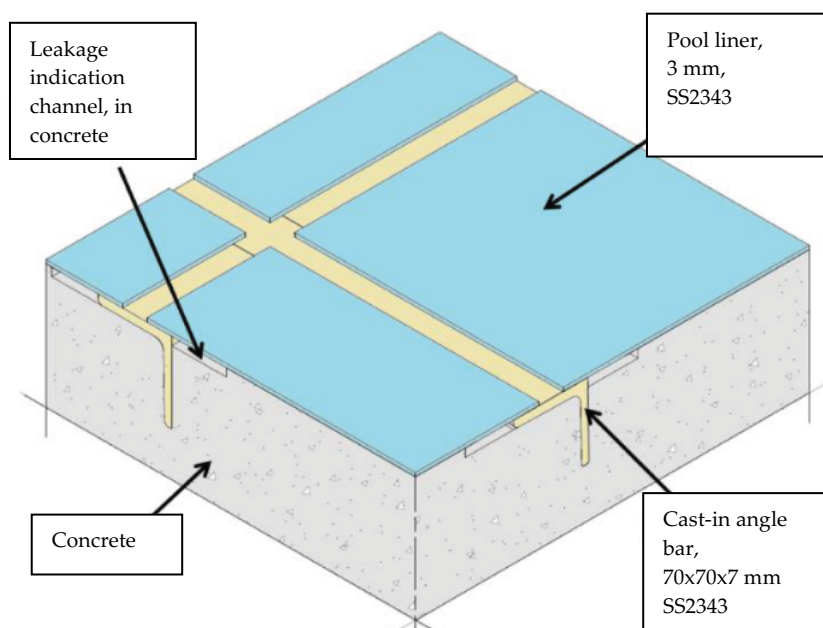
Schematic drawing of how the water is collected behind the welds inside the concrete wall.¹
